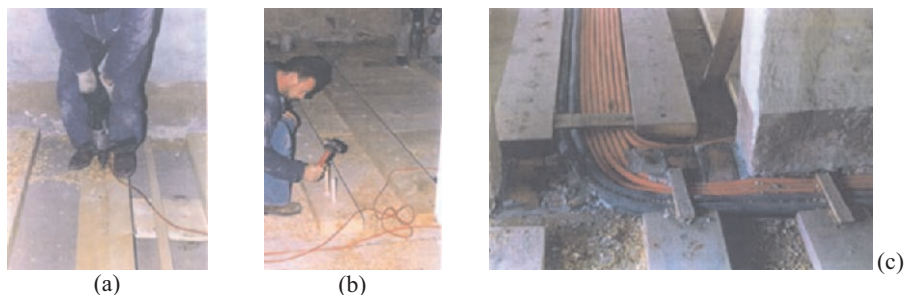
The phases of the intervention: fixing of the dowels on the strengthening planks (a) and detail of the technical installations placed between two planks (b).
